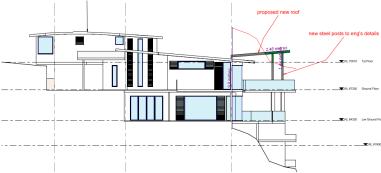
Eastern elevation side boundary envelope, breach indicated by green shading.
